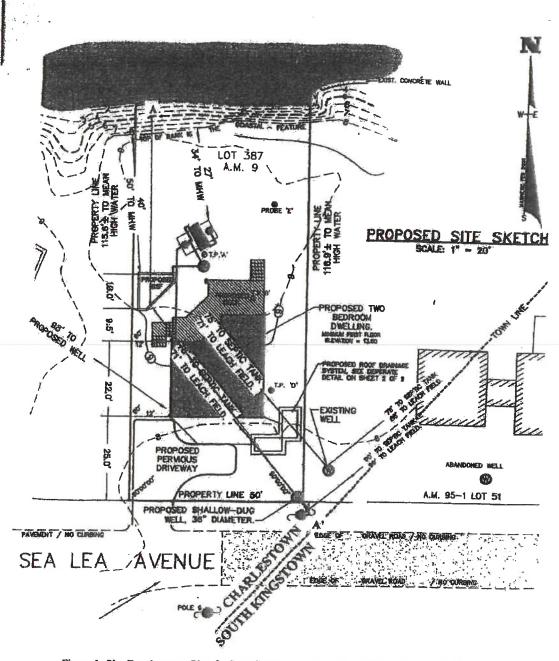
Site Development Plan for Lot 387 Showing Location of Cross-Section A-A'
